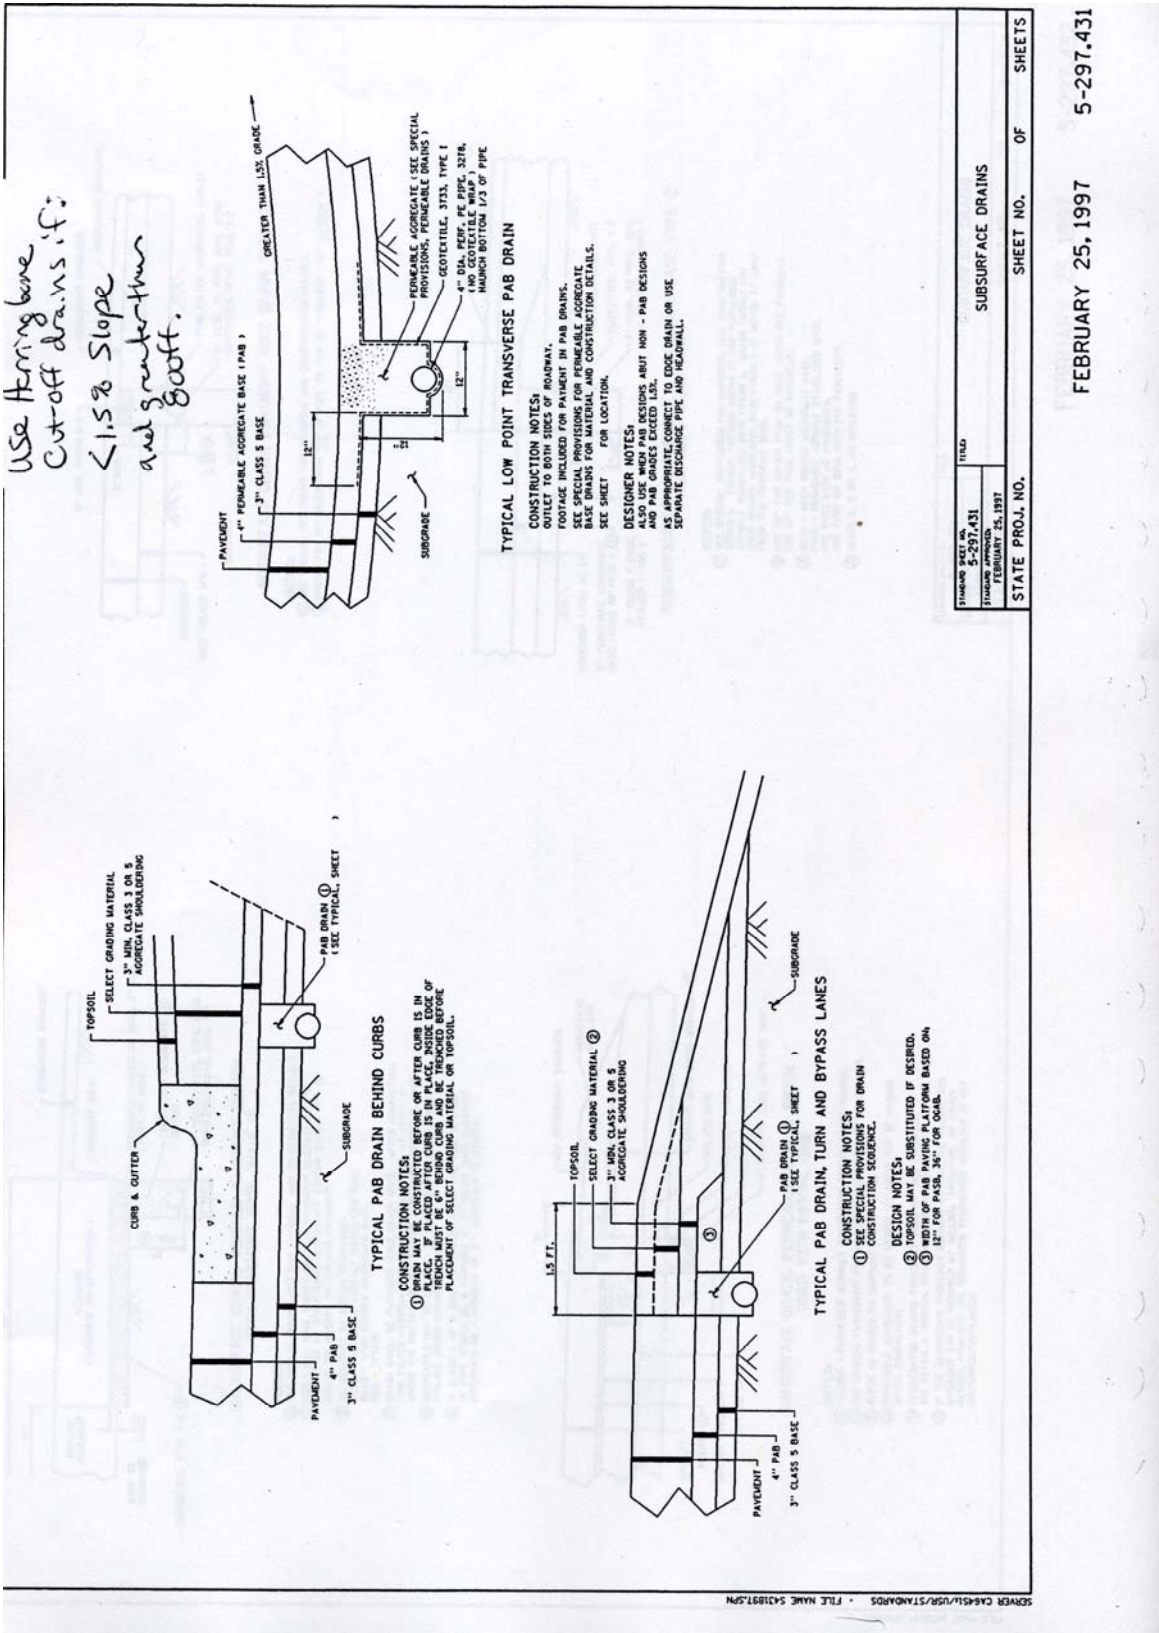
Typical PAB drain and their positioning (Mn/DOT, 1994b).
